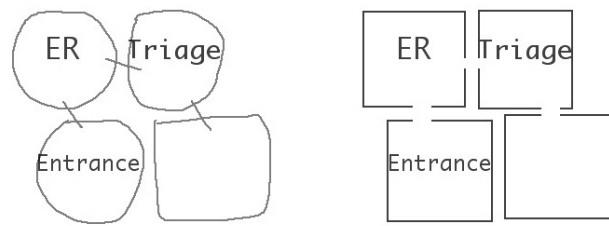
A Simple Floor plan in Sketch and Rectified Mode
